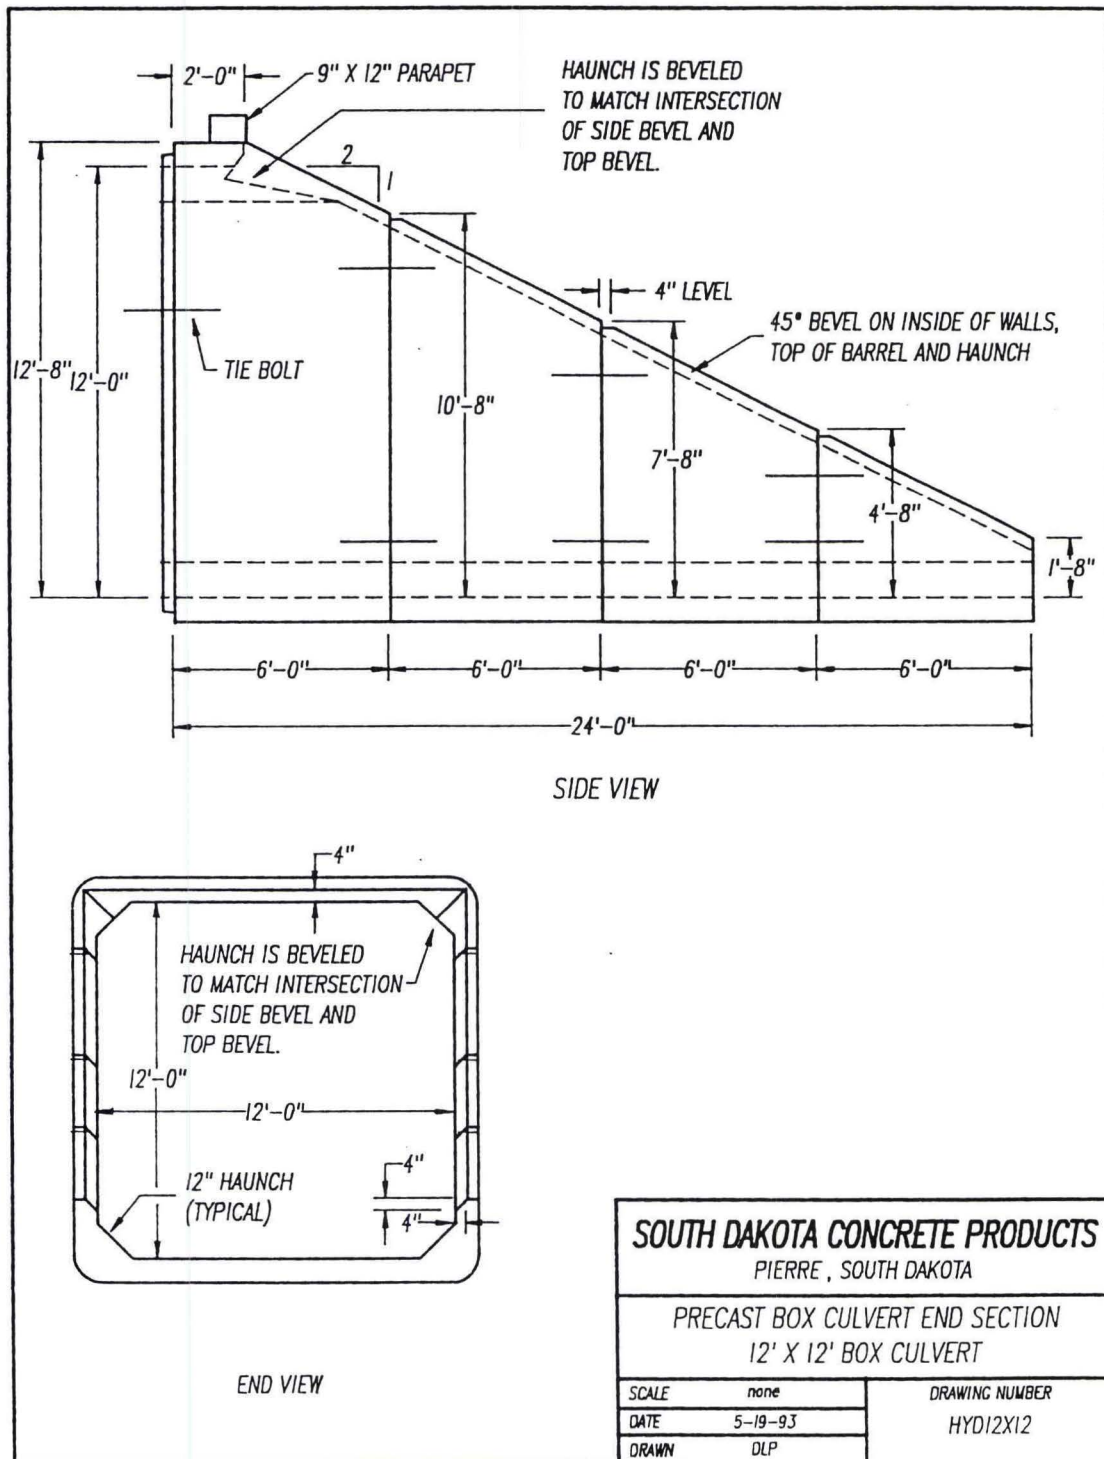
Schematic of the South Dakota precast culvert end section, 12 ft x 12 ft box (tested by culvert model 6).
